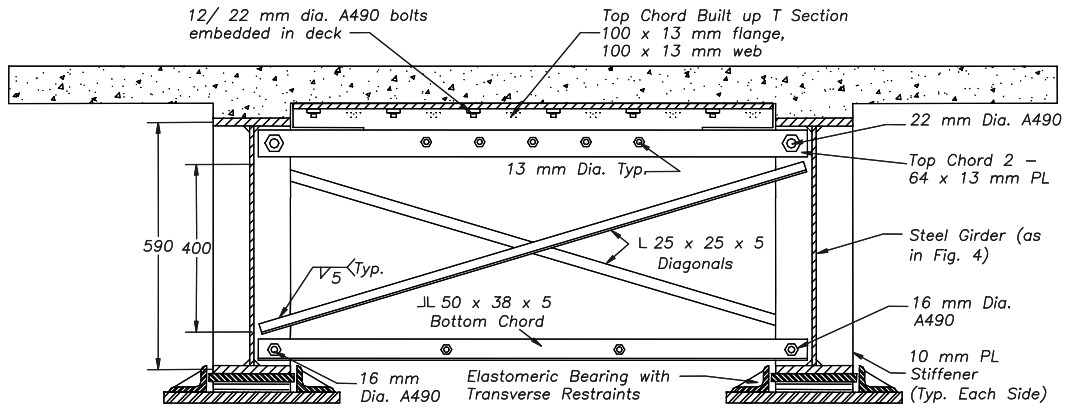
“Heavy” end cross frames in the bridge model with welded connections
